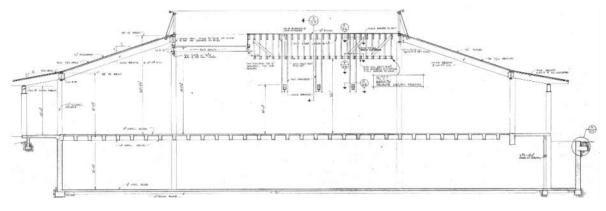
Full Building Longitudinal Section from 1965 Structural Drawings
